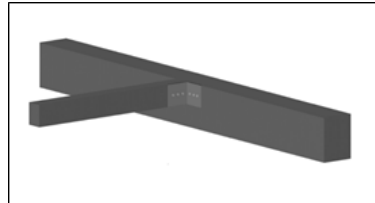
Connection of longitudinal girder and transverse beam (Delima 2018).
